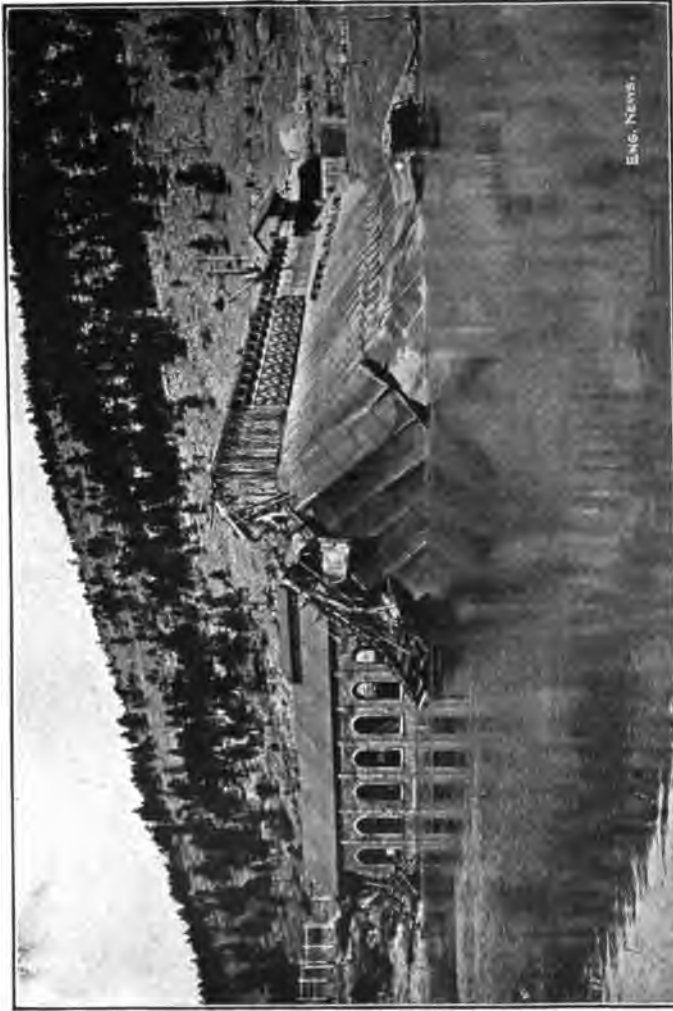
HAUSER LAKE DAM AS IT APPEARED APRIL 15, 1908.
